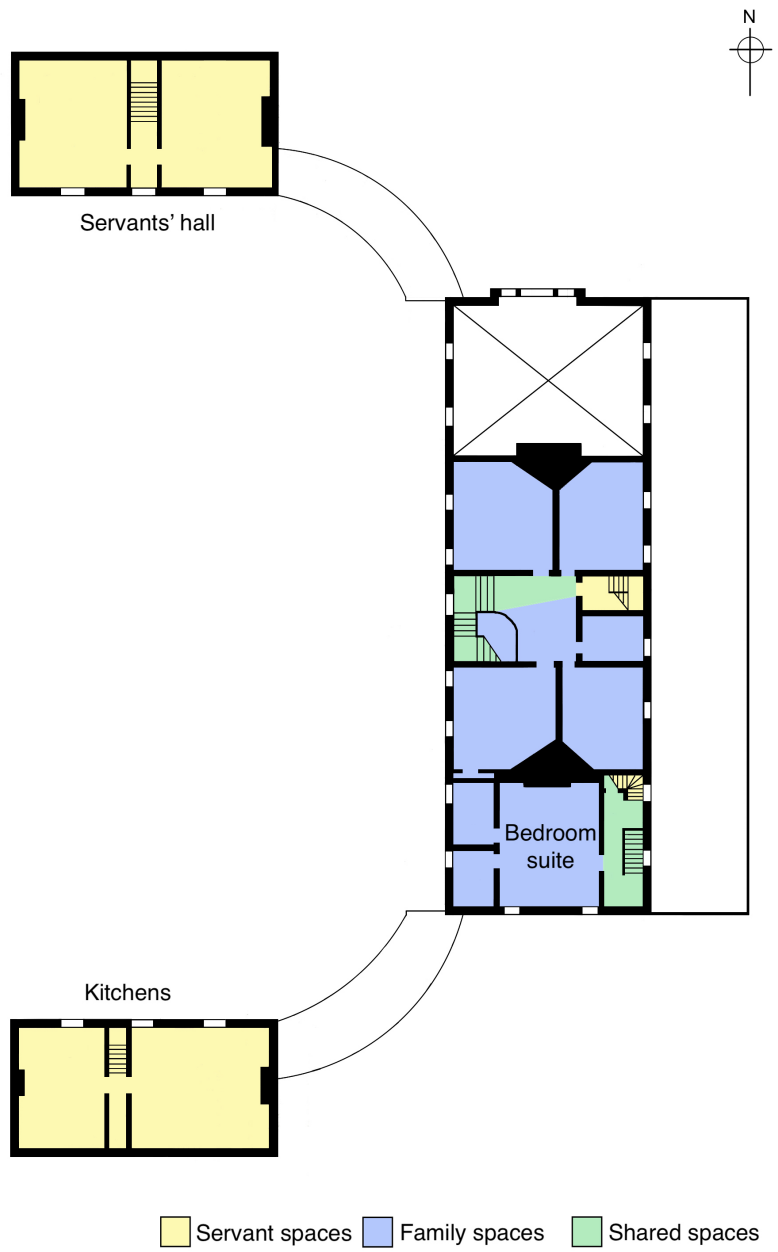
Mount Vernon c1799 Phase 2 first floor plan
